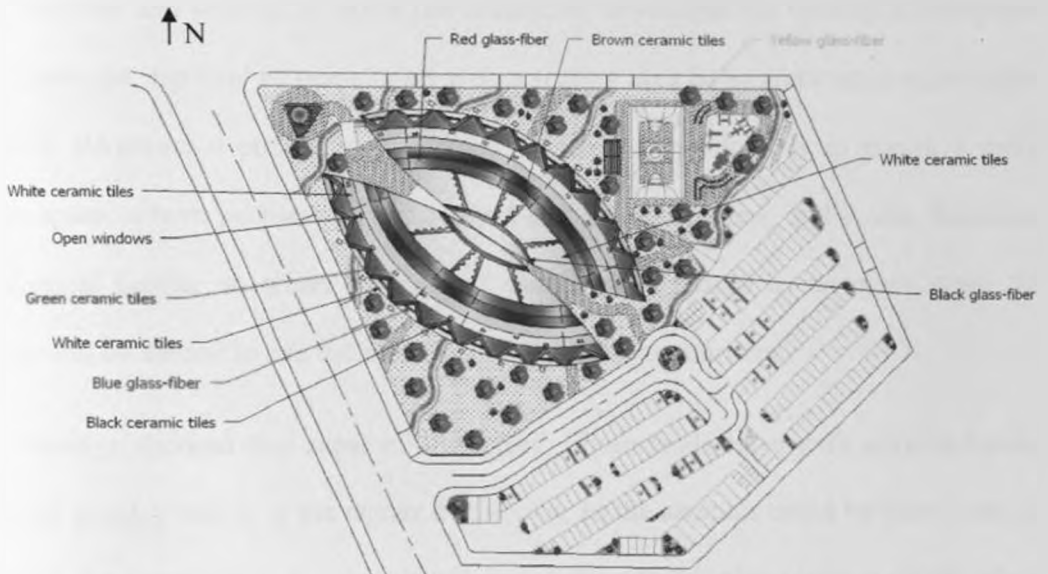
5 – Shells' layout with materials on a site plan. Source: Author. 2013.
